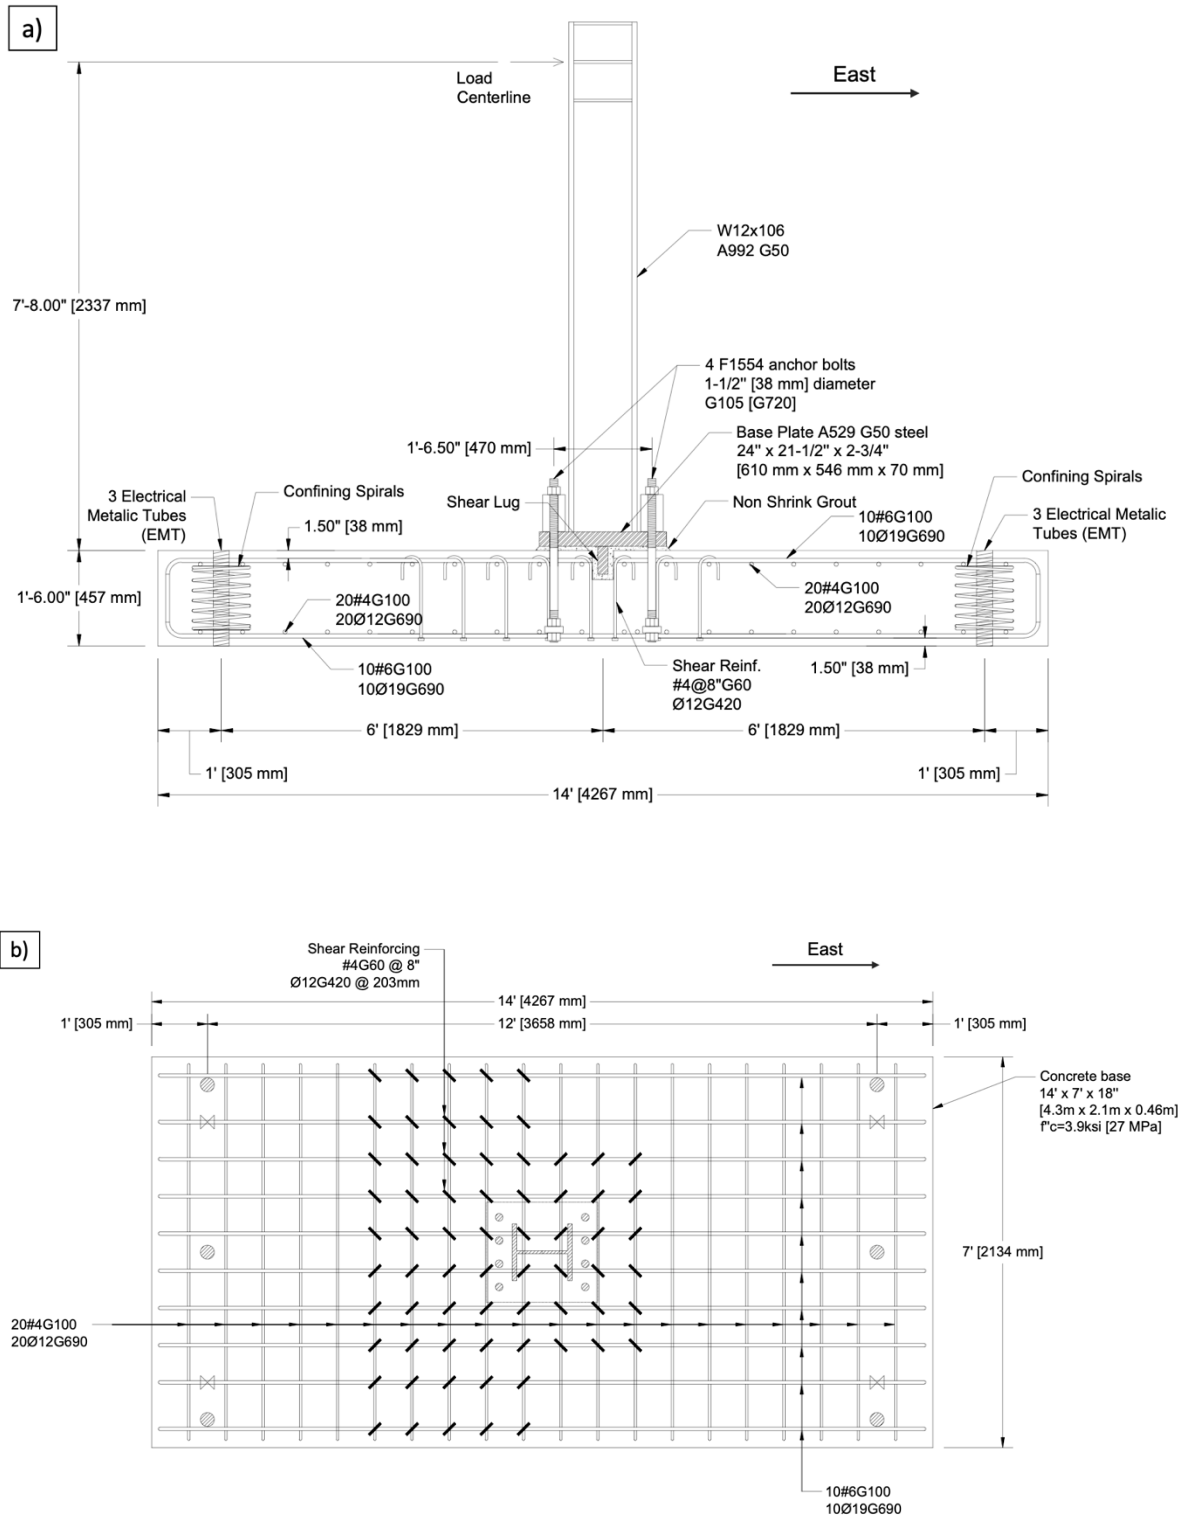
Elevation view a) and plan view b) of test specimen M02
